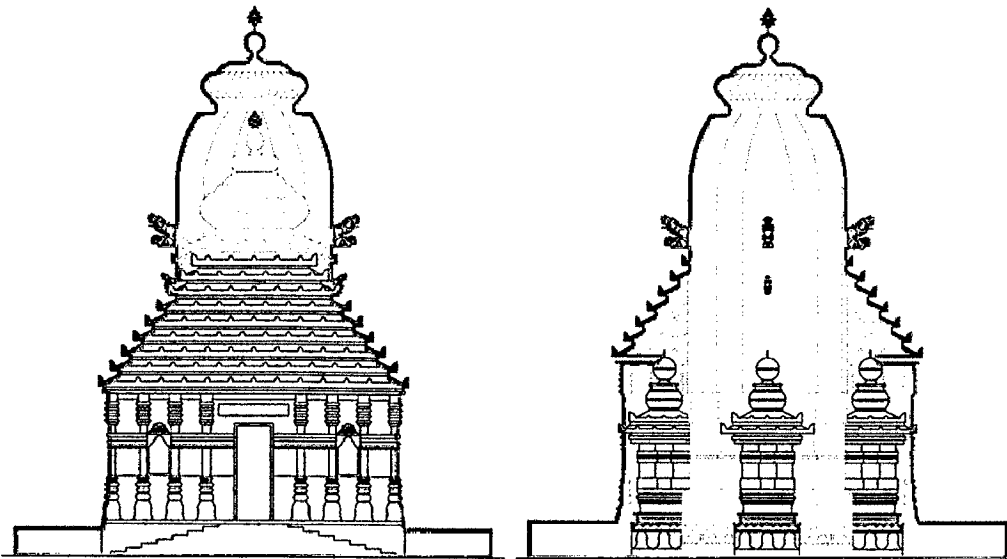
Front and Rear Elevation of Jagannath Temple, khandapara
